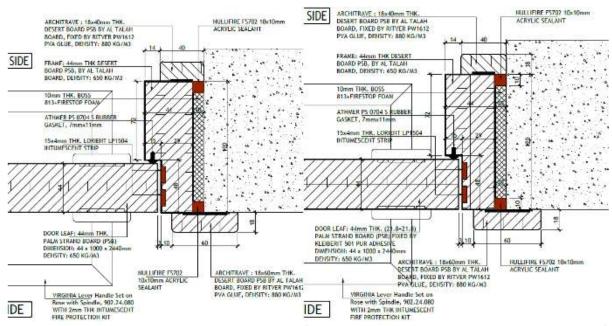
Door frame profile and door leaf core construction with sizes for Door 1 and 2, respectively.
